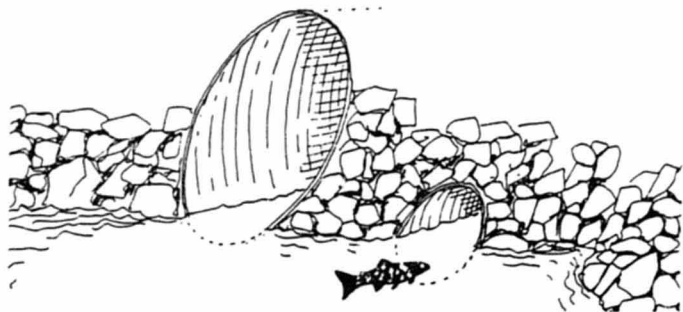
The arch culvert provides for fish passage (from Nelson et al. 1978).
